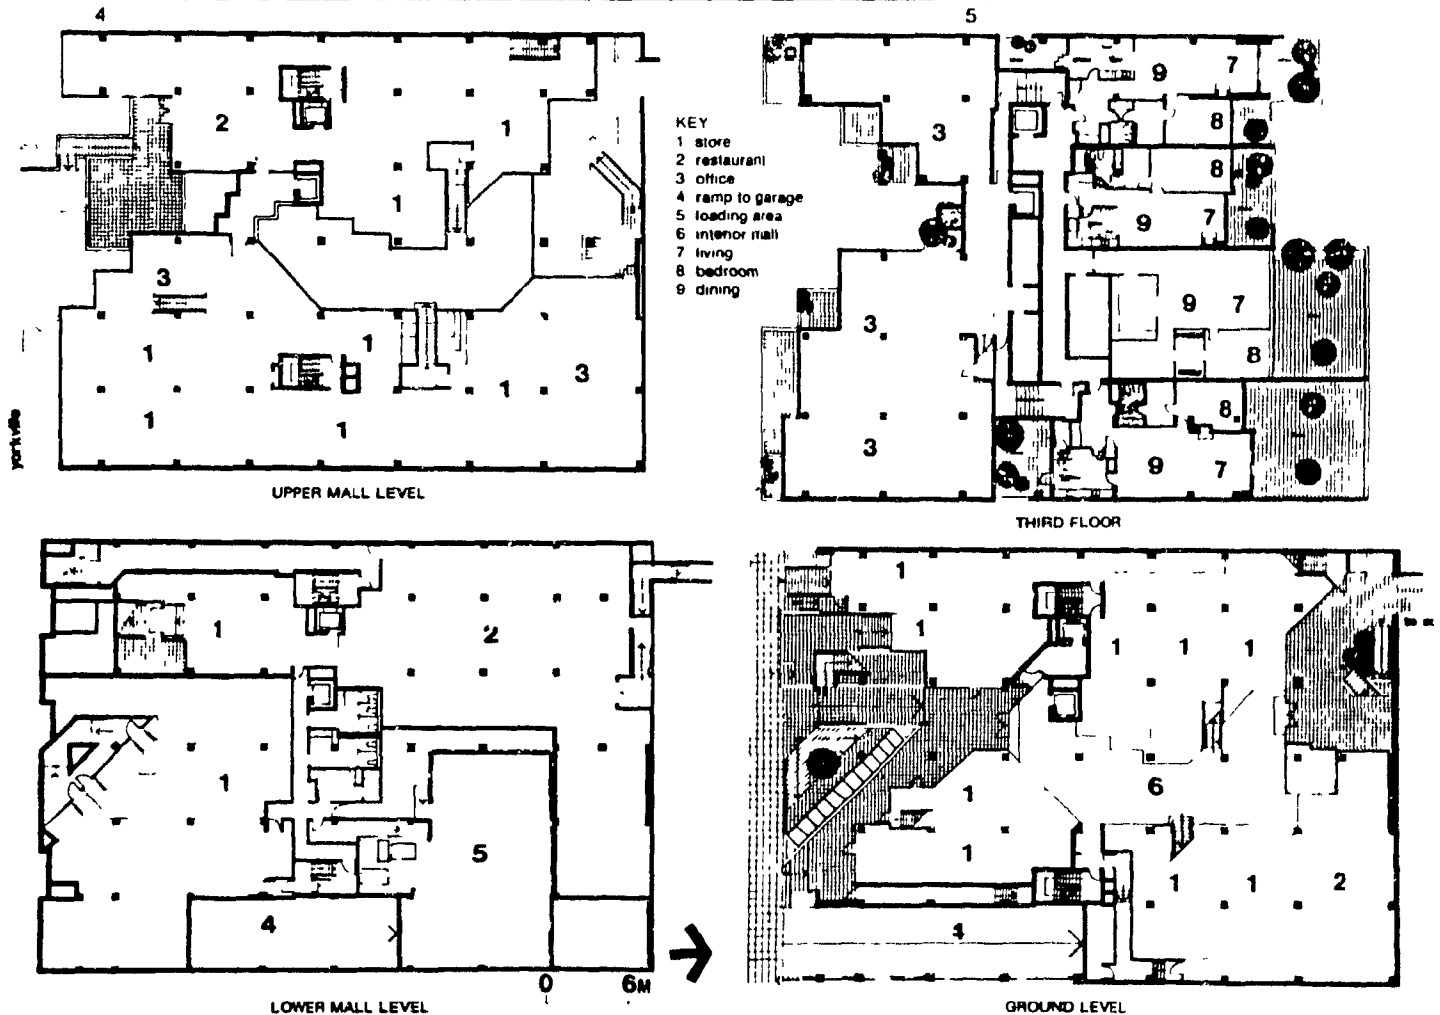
Terrace Exterior Stairs and Level Plans of The Village Stream in Toronto.
